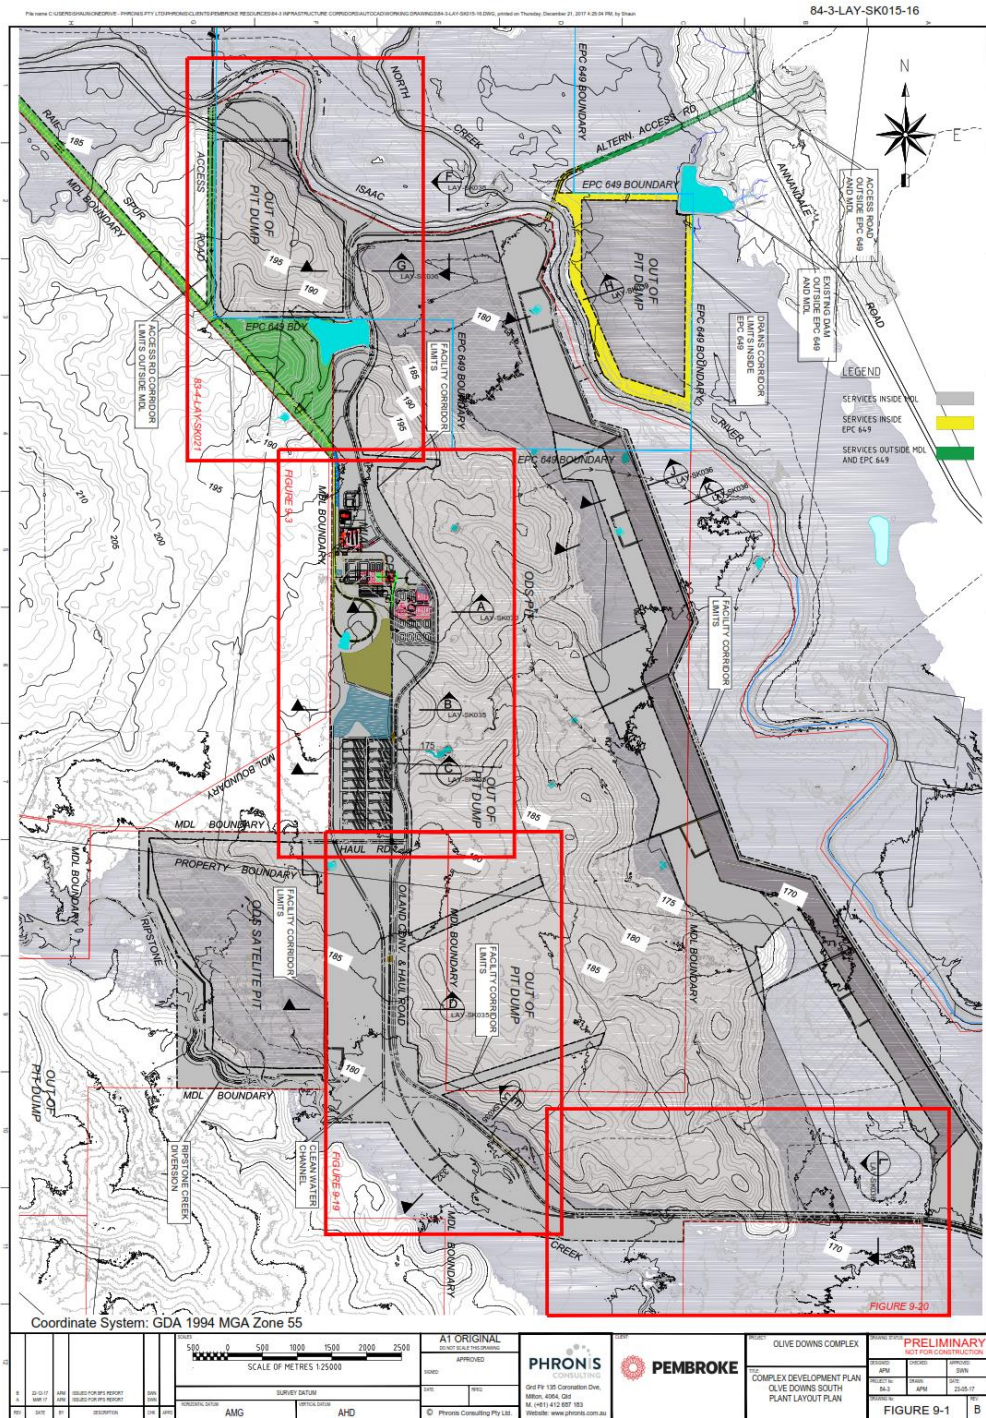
Complex Development Plan – ODS – CHPP Detailed Layout Plan
